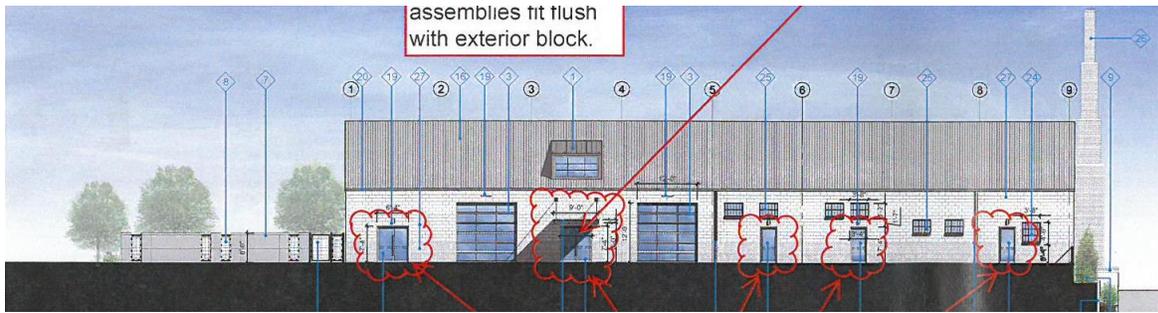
Approved LAC drawings, West Elevation, 2016. Note indicates existing doors to be changed to glass and construction of canopies at the entrances.
